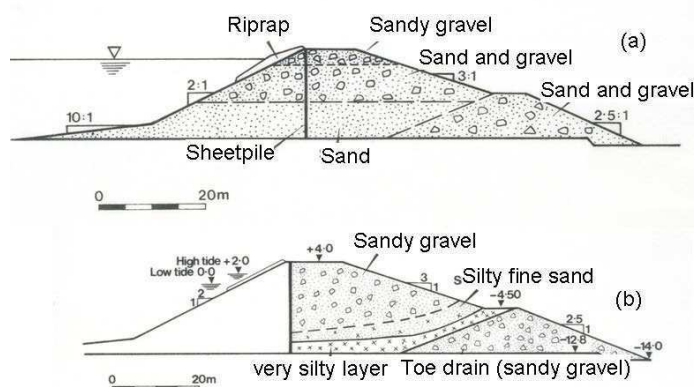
Cross section through cofferdam for Dubai Dry Dock: (a) as intended, (b) as built.
